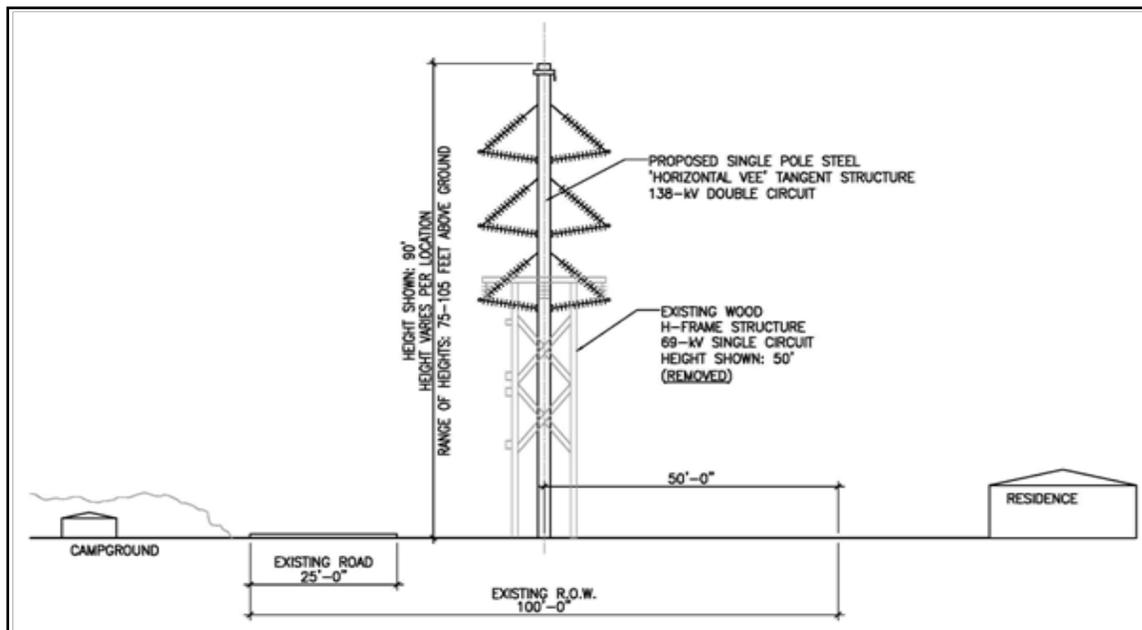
Typical Profile of Existing ROW with New Single-Pole Steel Structure East of CR64 and Cutthroat Bay Campground.
